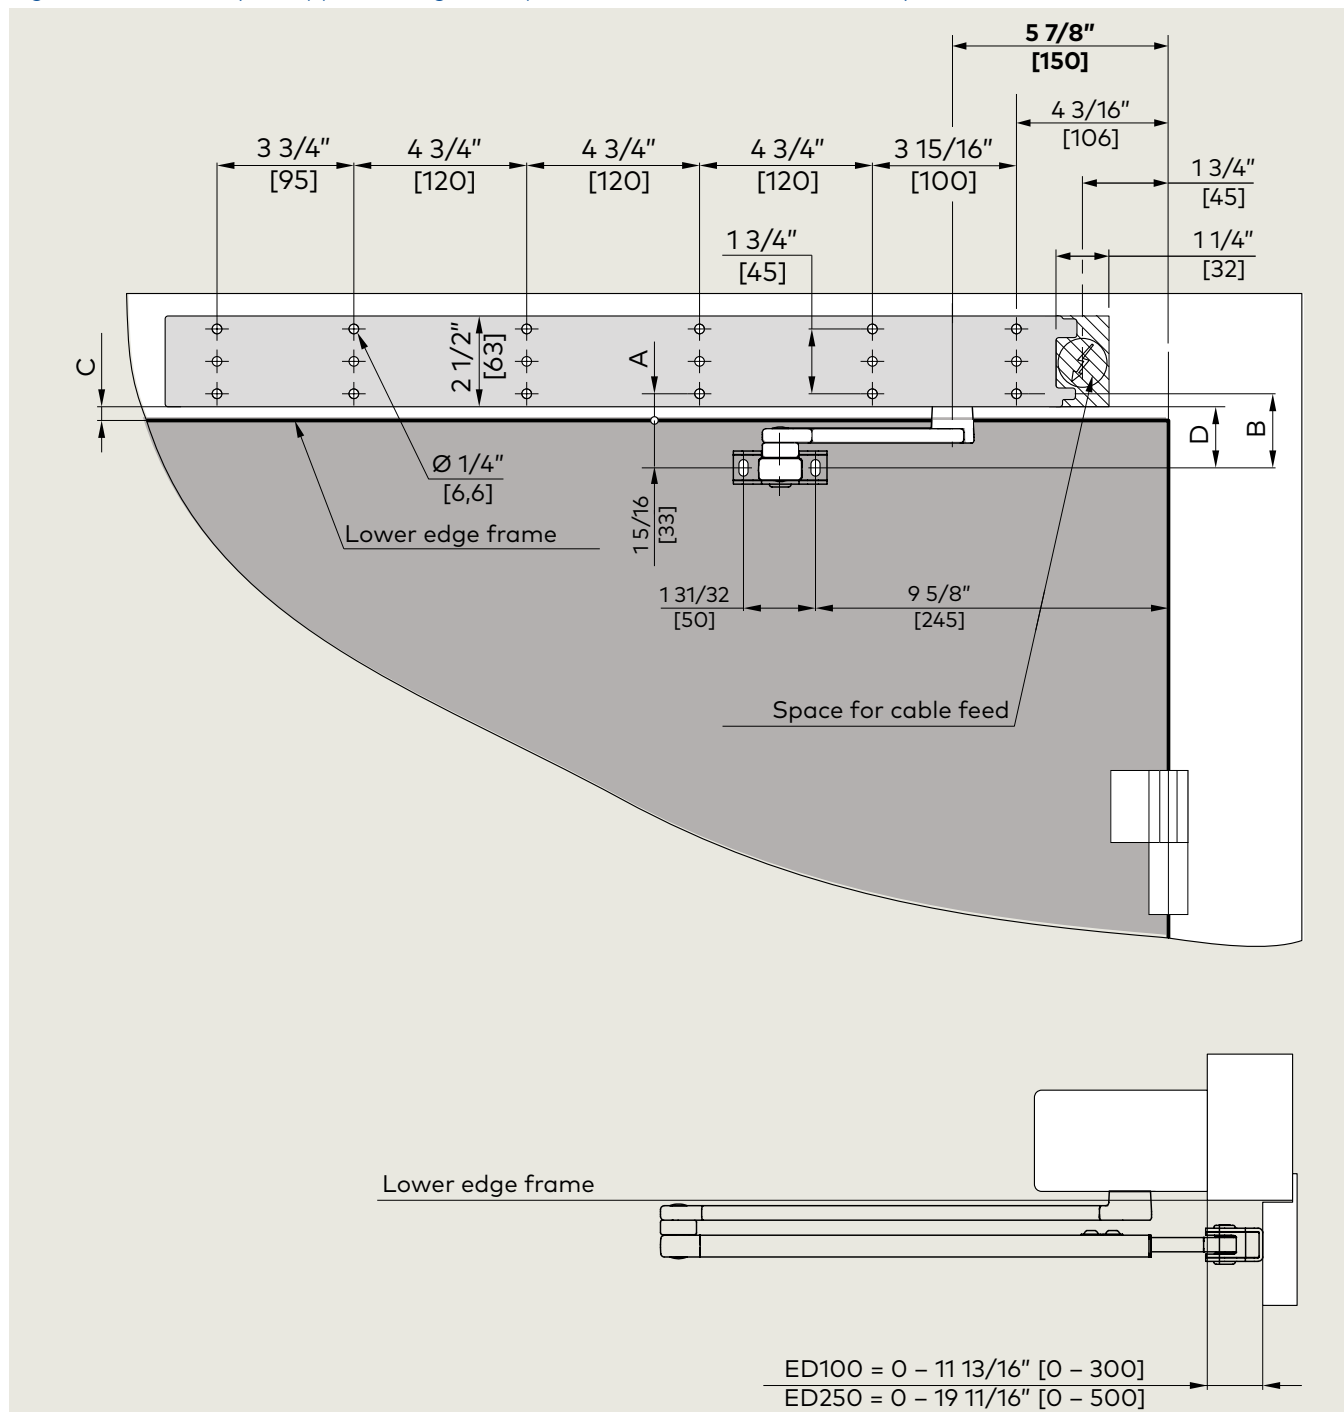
Assembly on opposite hinge side, push version with slide channel and short pivot pin
